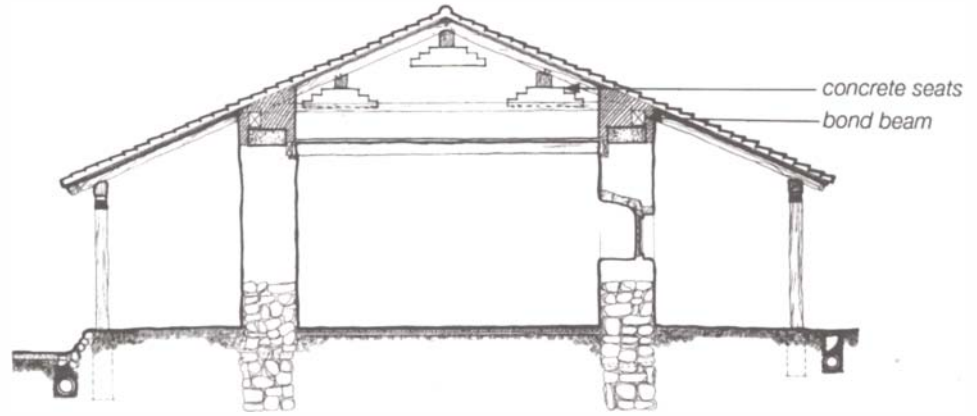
Mission Adobe at Santa Cruz Mission State Historic Park, 1822-24. Restoration and seismic strengthening with bond beam. Project included reconstructing four crosswalls which had been removed. Gil Sánchez, FAIA, architect.
